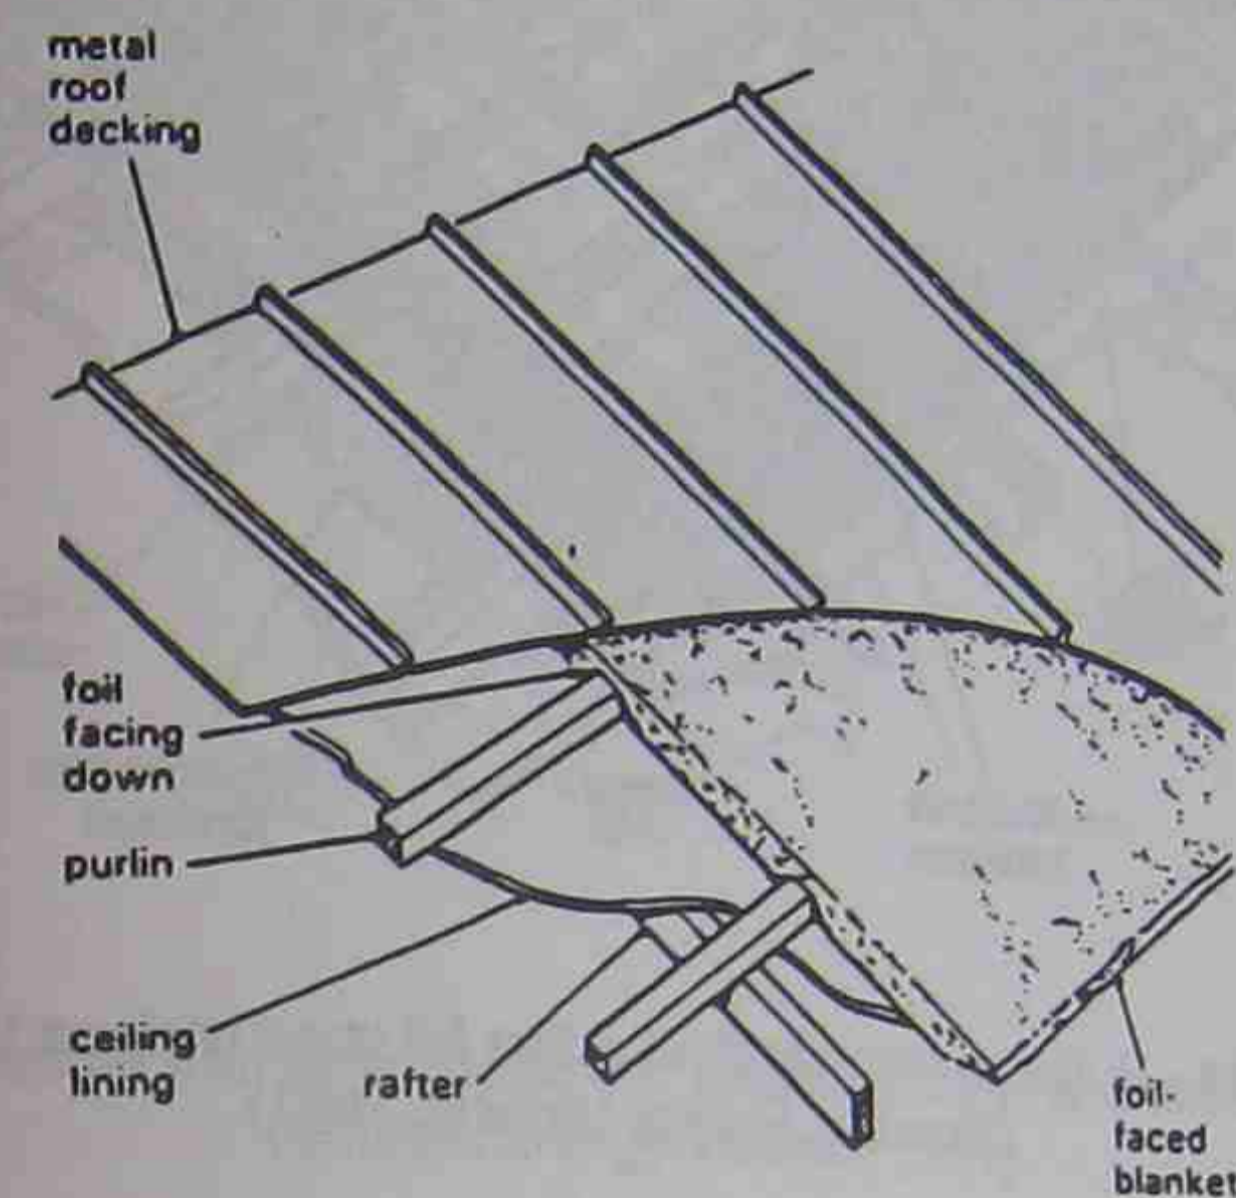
Foil-backed bulk insulation in a cathedral ceiling where rafters are exposed.
